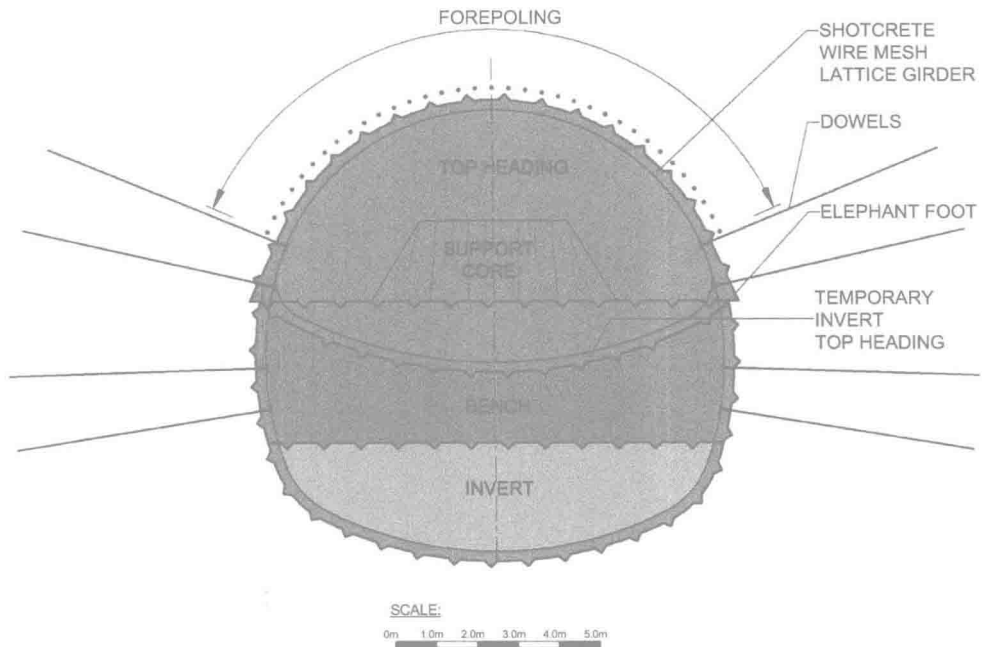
Typical excavation and support in soft ground conditions [NATM – the Austrian way of conventional tunneling; ISBN 978-3-200-01989-8].
